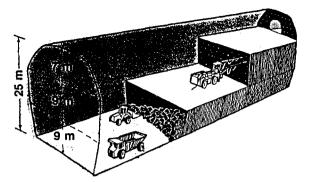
Chamber excavation with two benches and horizontal driling with a jumbo.
